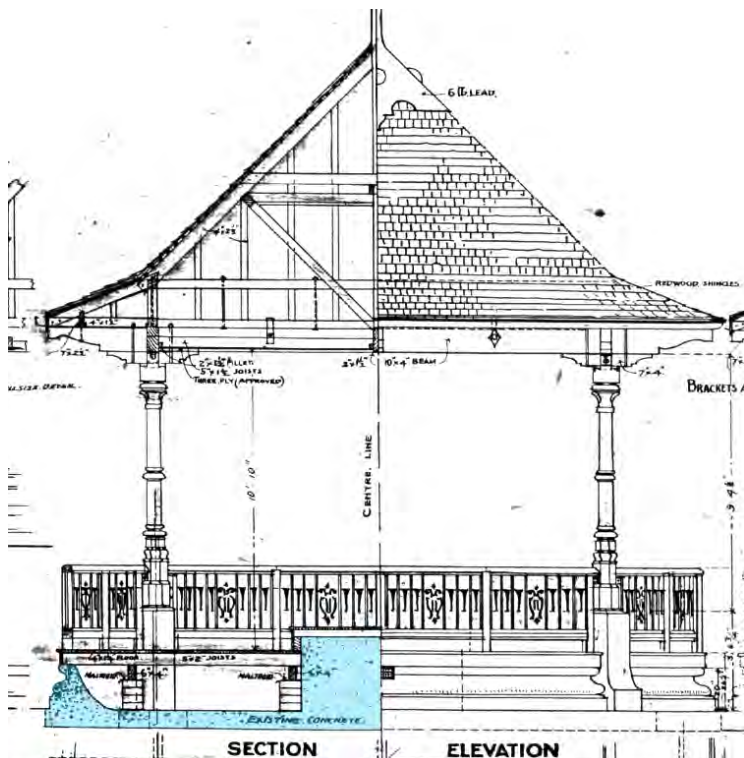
Extract showing the location of the existing concrete which has been highlighted in blue. Source: PWD Plan Room, now Plan Services
